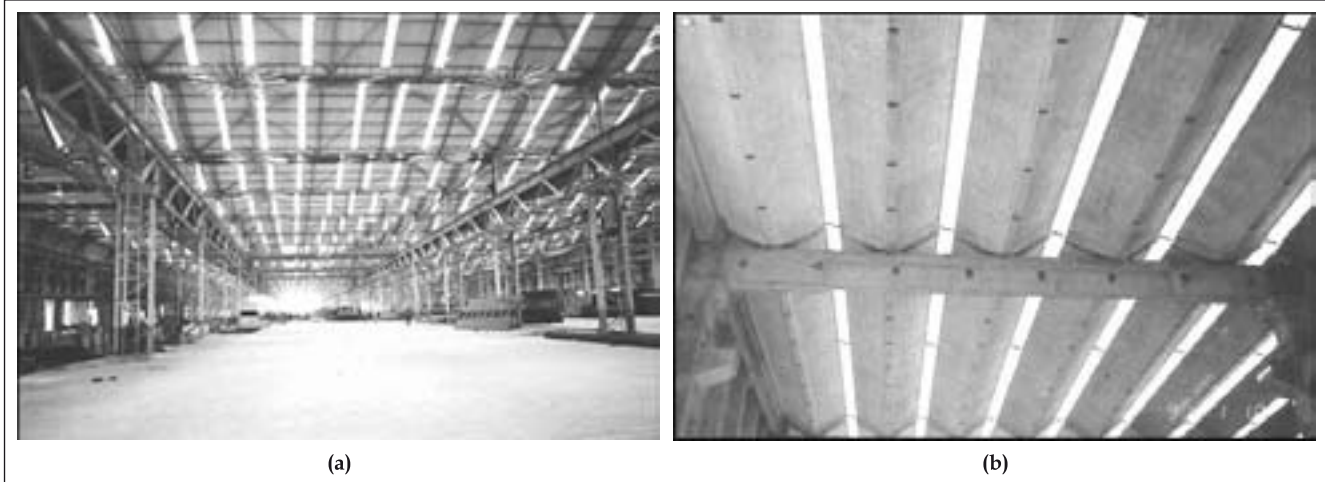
(a) Strip lighting, structural steel roof - 1980 (b) Strip lighting, precast concrete roof - 1990
